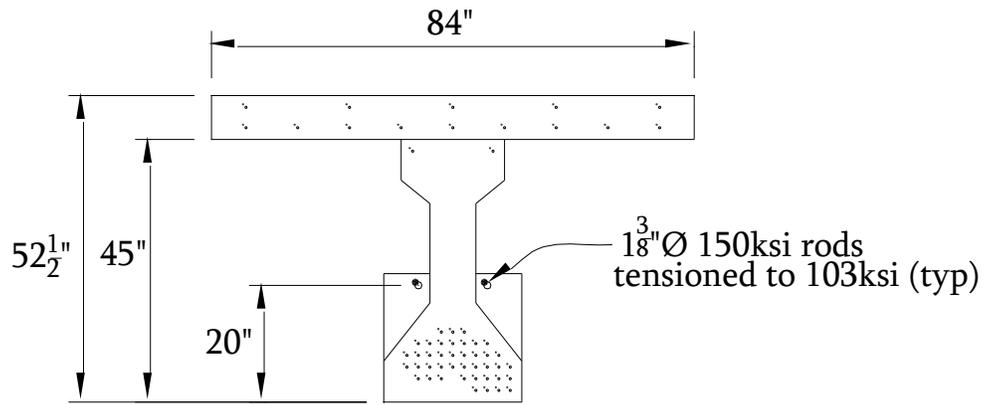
External post-tensioned steel repaired IB 10-2-1 drawing.
